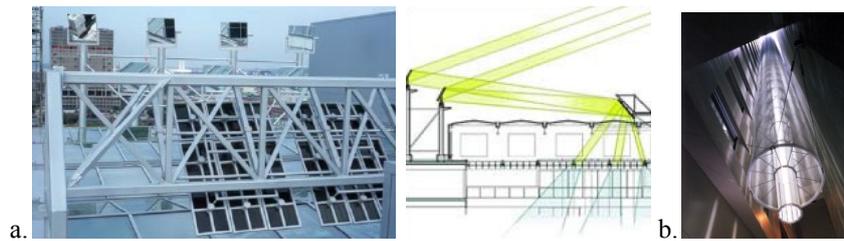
a. Roof mounted mirrors (heliostats) directing sunlight into the building through a skylight, b. A 14-storey height sun pipe [26, Mayhoub 2014]
